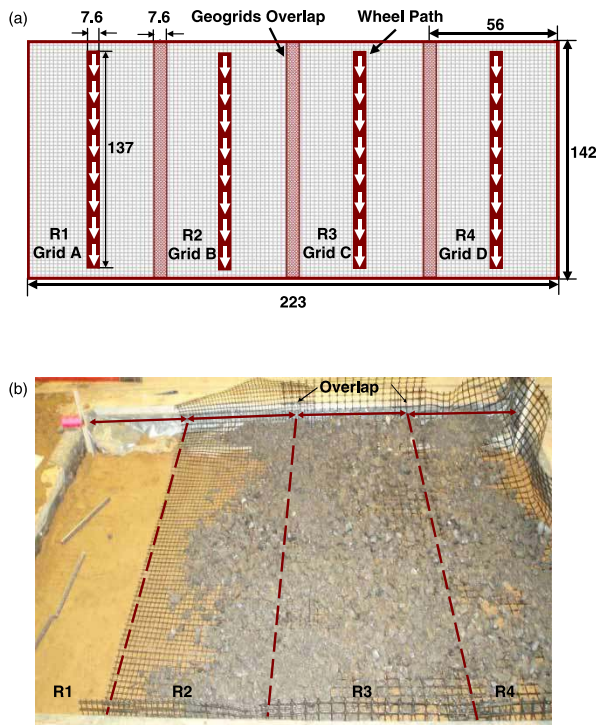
Pavement section layout: (a) dimensions, units in cm and (b) plan view of the section and geogrid installation.
